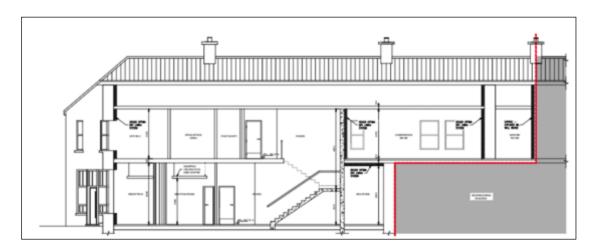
Elevation indicating stairway leading from ground level to first floor.
